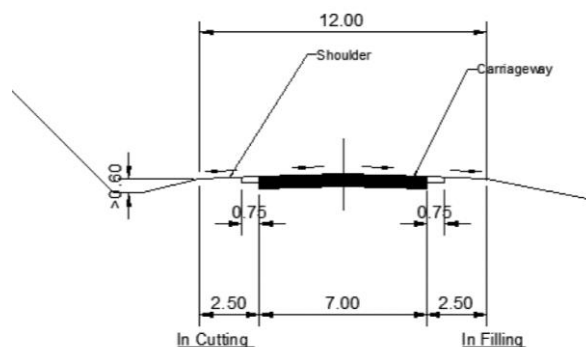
Typical Cross Section of Class II Road in Nepal Road Standard 2070 B.S (July, 2013 A.D.)
